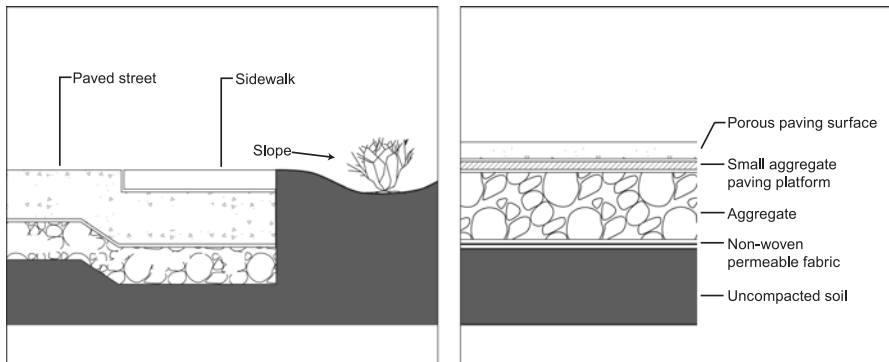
Sidewalk can be placed at the road level to let rainwater flow to bioswales
